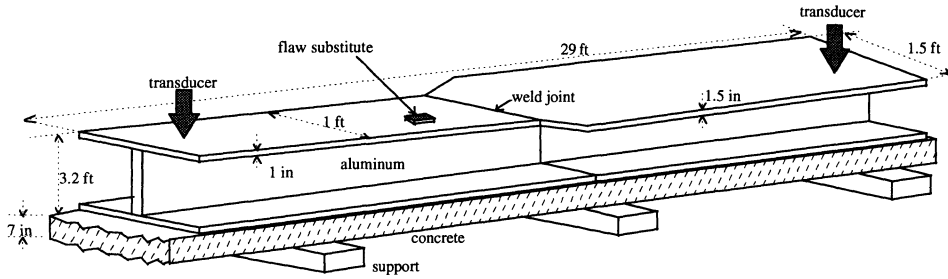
Test specimen for the Aluminum bridge girder experiment.
